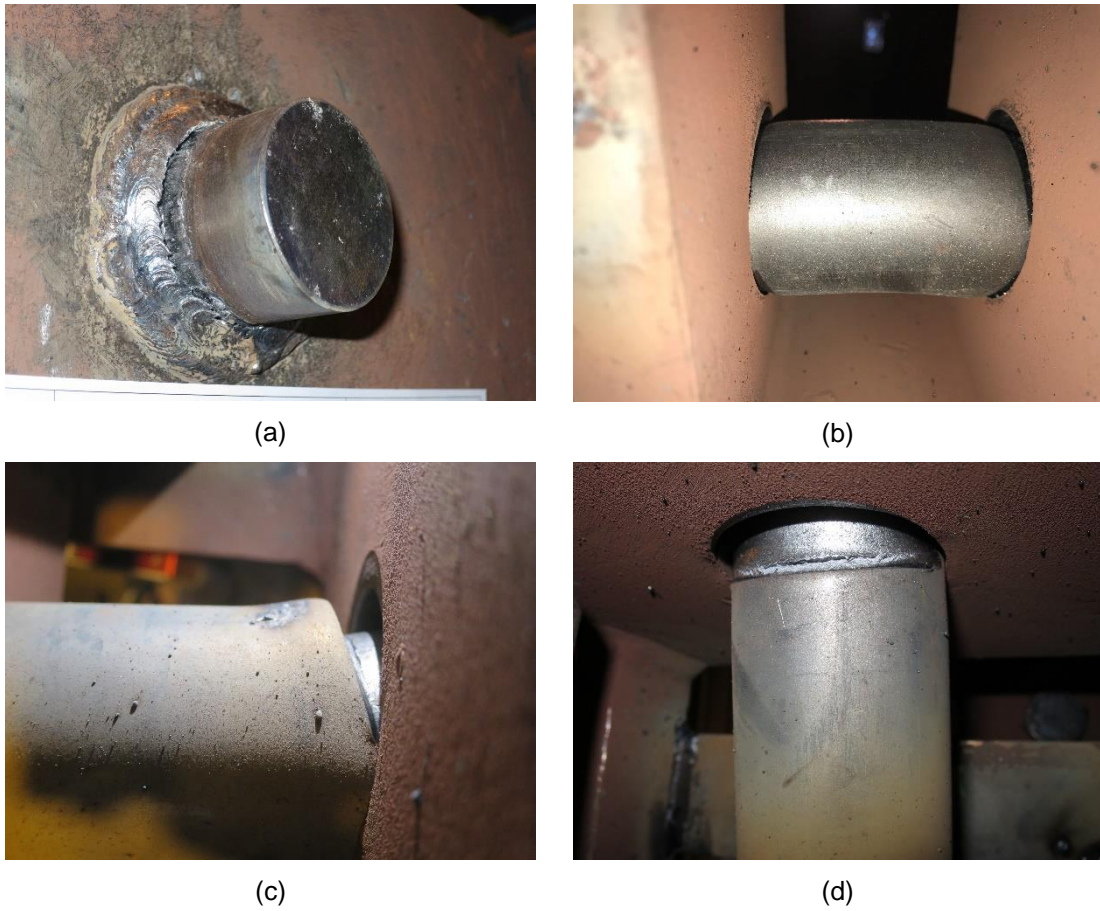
Experimental test 17C: (a) weld failure, (b) mid-span undeformed section, (c) & (d) pin failure.
